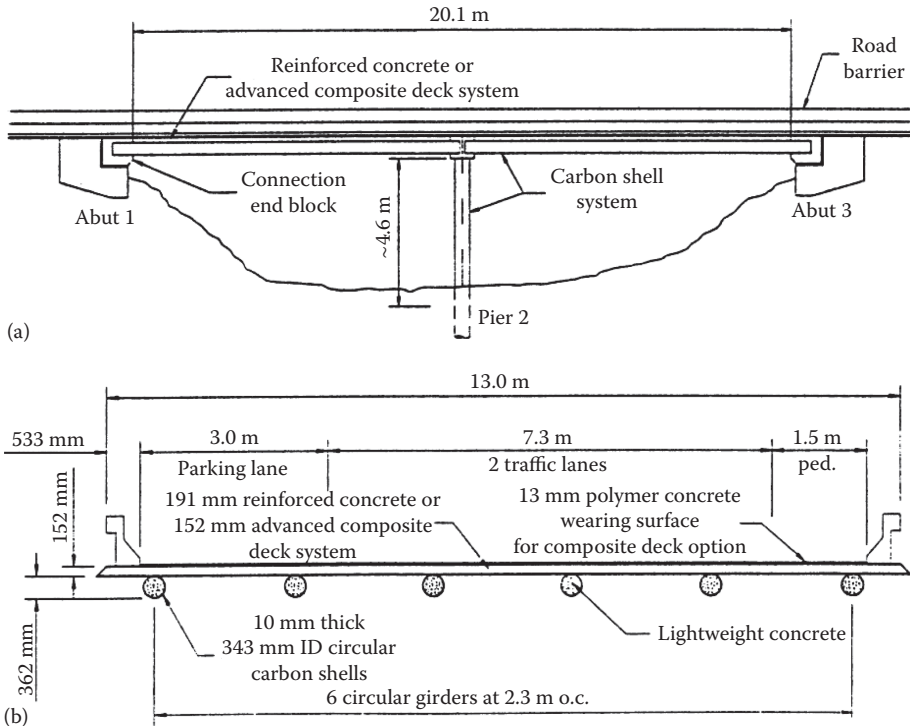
Carbon shell girder-type bridge system. (a) Longitudinal section. (b) Transverse section. (From Seible, F. et al., Design issues with carbon fiber composite reinforced concrete structures, *Proceedings of the Third International Symposium, Non-Metallic (FRP) Reinforcement for Concrete Structures*, Vol. 2, Sapporo, Japan, October, pp. 89–112, 1997.)
